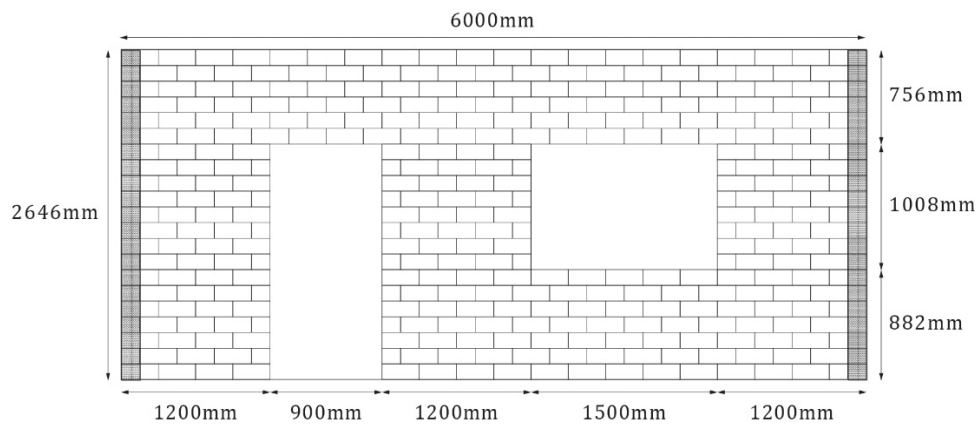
Wall W1 layout and dimensions for reduced window opening
